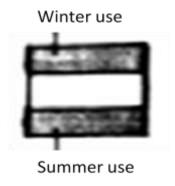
Inner courtyard plan in Diyarbakir traditional houses (Bekleyen & Dalkiliç, 2011)
